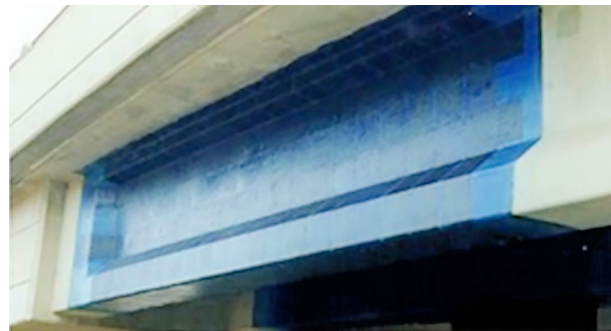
Externally-bonded carbon FRP sheets for shear strengthening of a reinforced concrete bridge girder (photo from http://www.fhwa.dot.gov/everydaycounts/technology/bridges/pbeswebinartraining/s3_m9.cfm)
